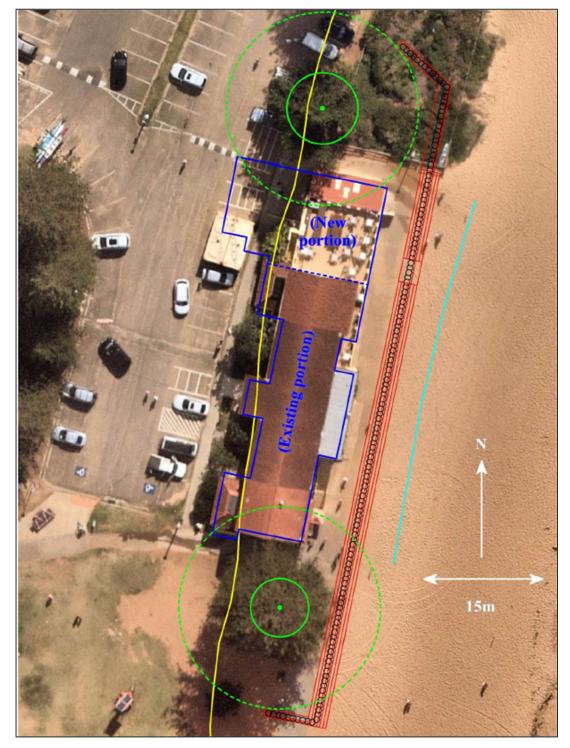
Layout of proposed seawall and SLSC building alterations (source: Horton, 2021b)
